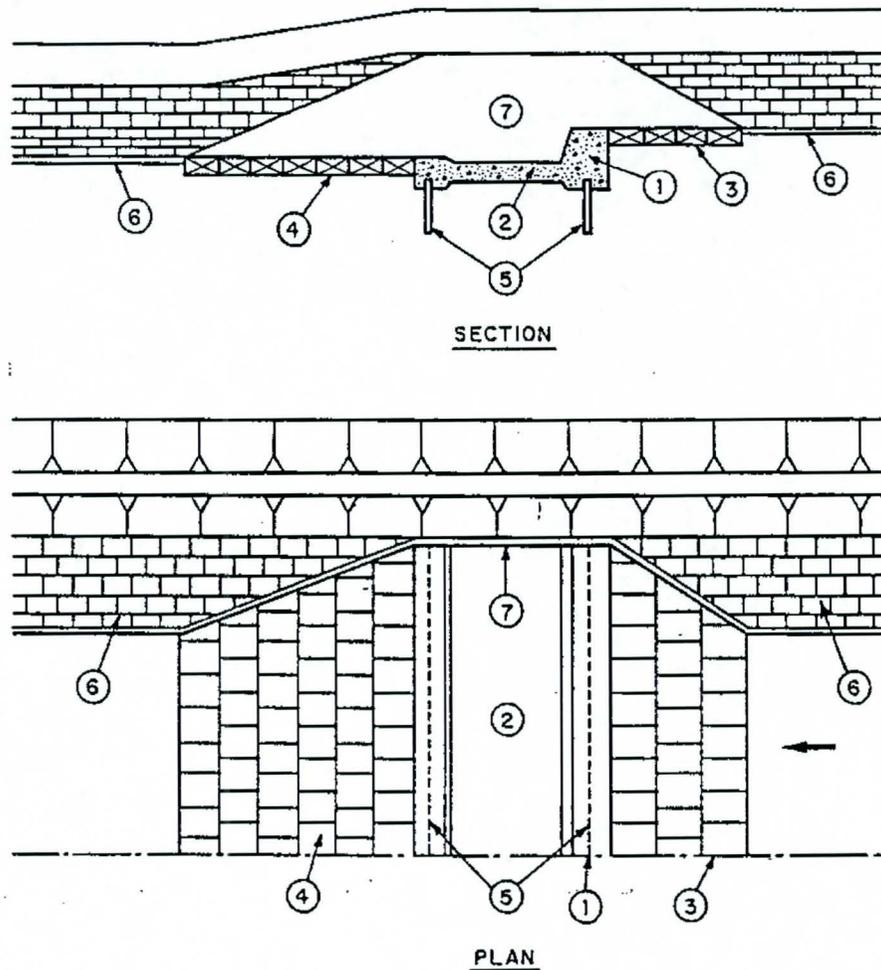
A typical Japanese low-head drop structure. (after Japanese Ministry of Construction 1985)
